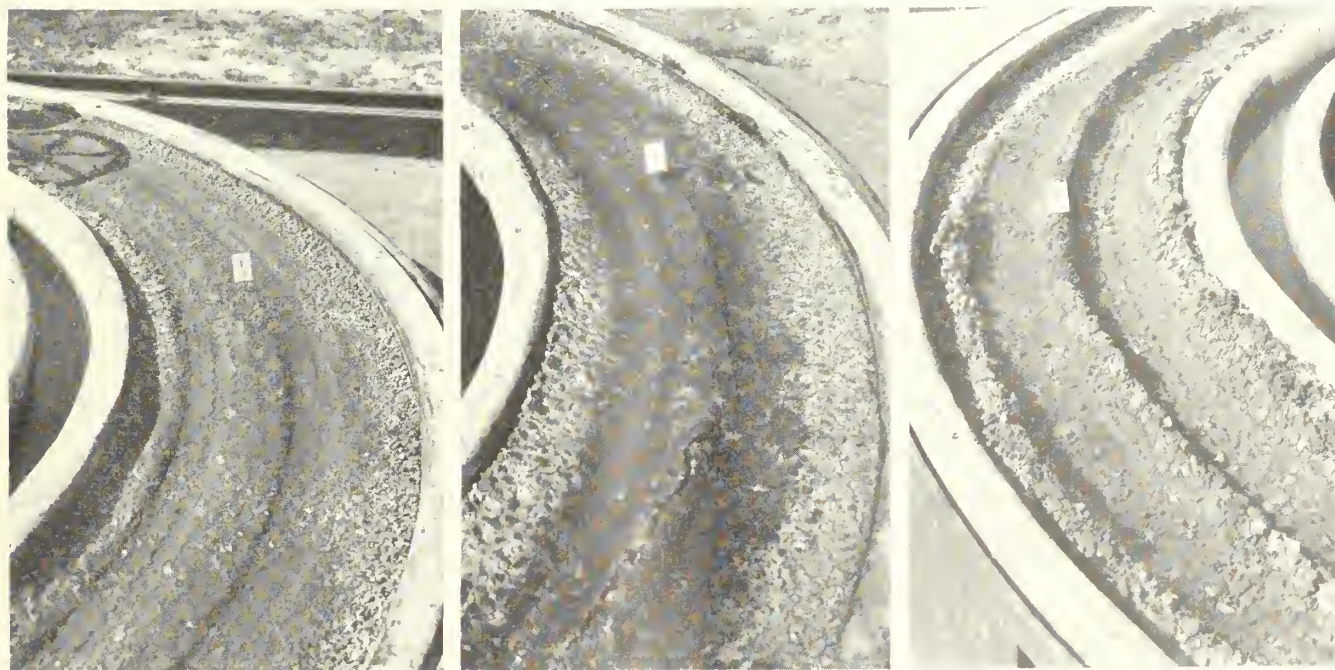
SECTIONS OF TRACK 1 AT THE CONCLUSION OF THE TEST. LEFT, SECTION 1, WHICH IS ALSO REPRESENTATIVE OF SECTIONS 2 AND 3; MIDDLE, SECTION 4; RIGHT, SECTION 5.
